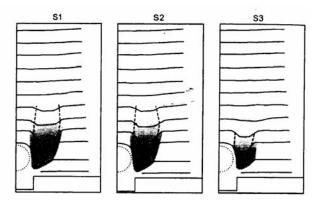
Failure mechanisms of the transverse sections of Model 3 (rigid pipe in loose backfill)
